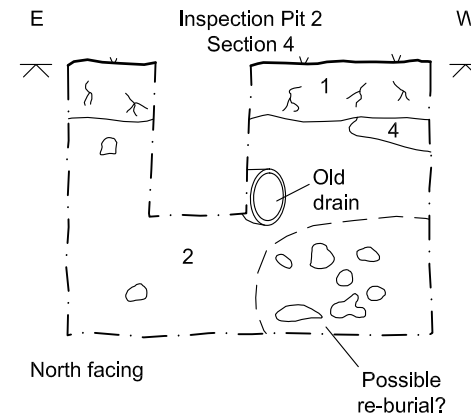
North facing section of Inspection Pit 2. Scale 1:25
